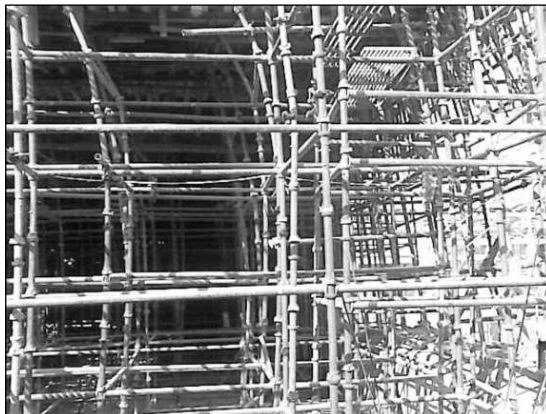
View of the Bent Shoring (Due to Excess Load).
